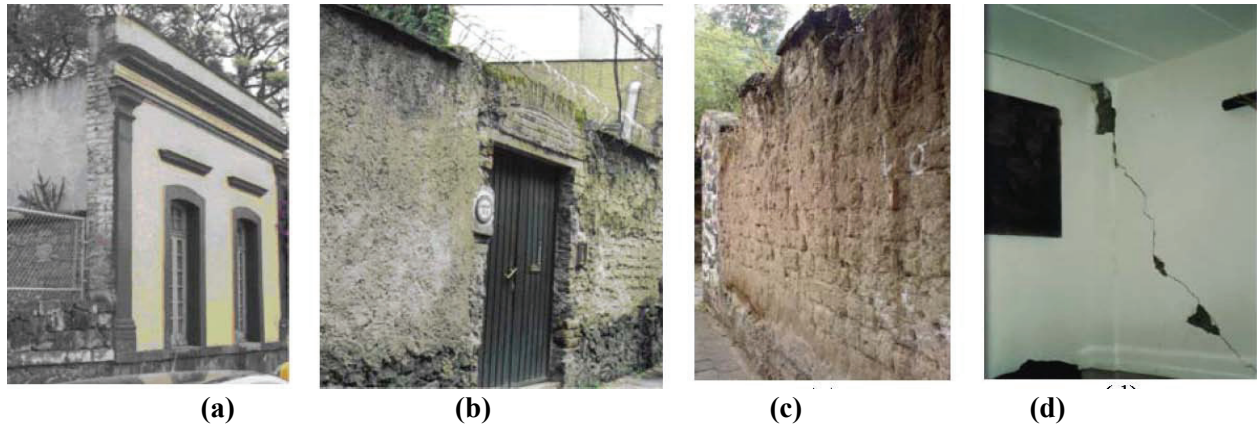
Adobe houses in Coyoacan D.F. (a) The first photo shows a good coverage of cement in its facade. (b) The facade neglected, without frames in its door. These houses have a wall in its base with stones near 1 m. (c) It is a fence made of adobe without columns, only a short wall of stones in its base. (d) Shows a diagonal crack in its interior as in its exterior. in the room with adobe walls (church “La Conchita”).
